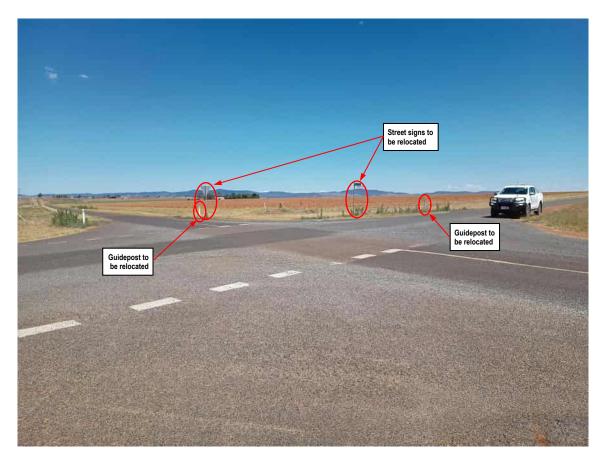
Mannuem Road / Ironpot Road Intersection (Location 16) Looking South-West
